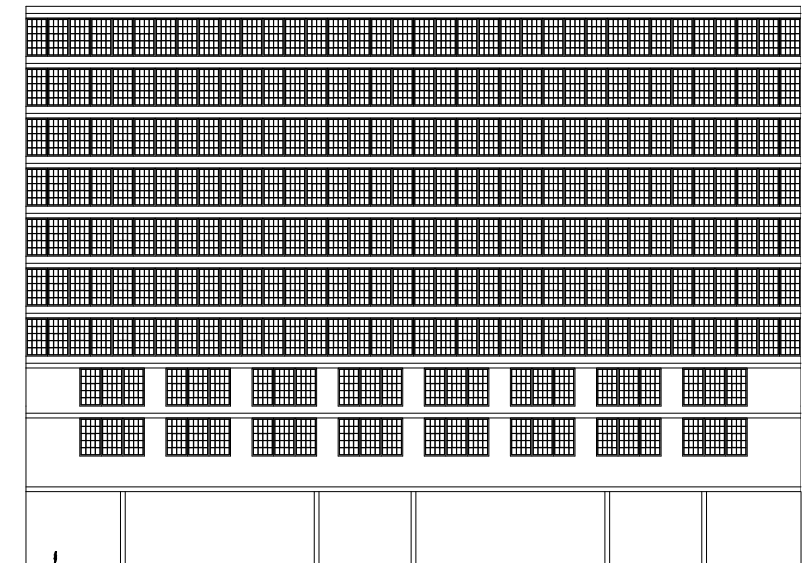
Elevation of the Starett-Lehigh building, a large brick warehouse constructed from a formal grid
